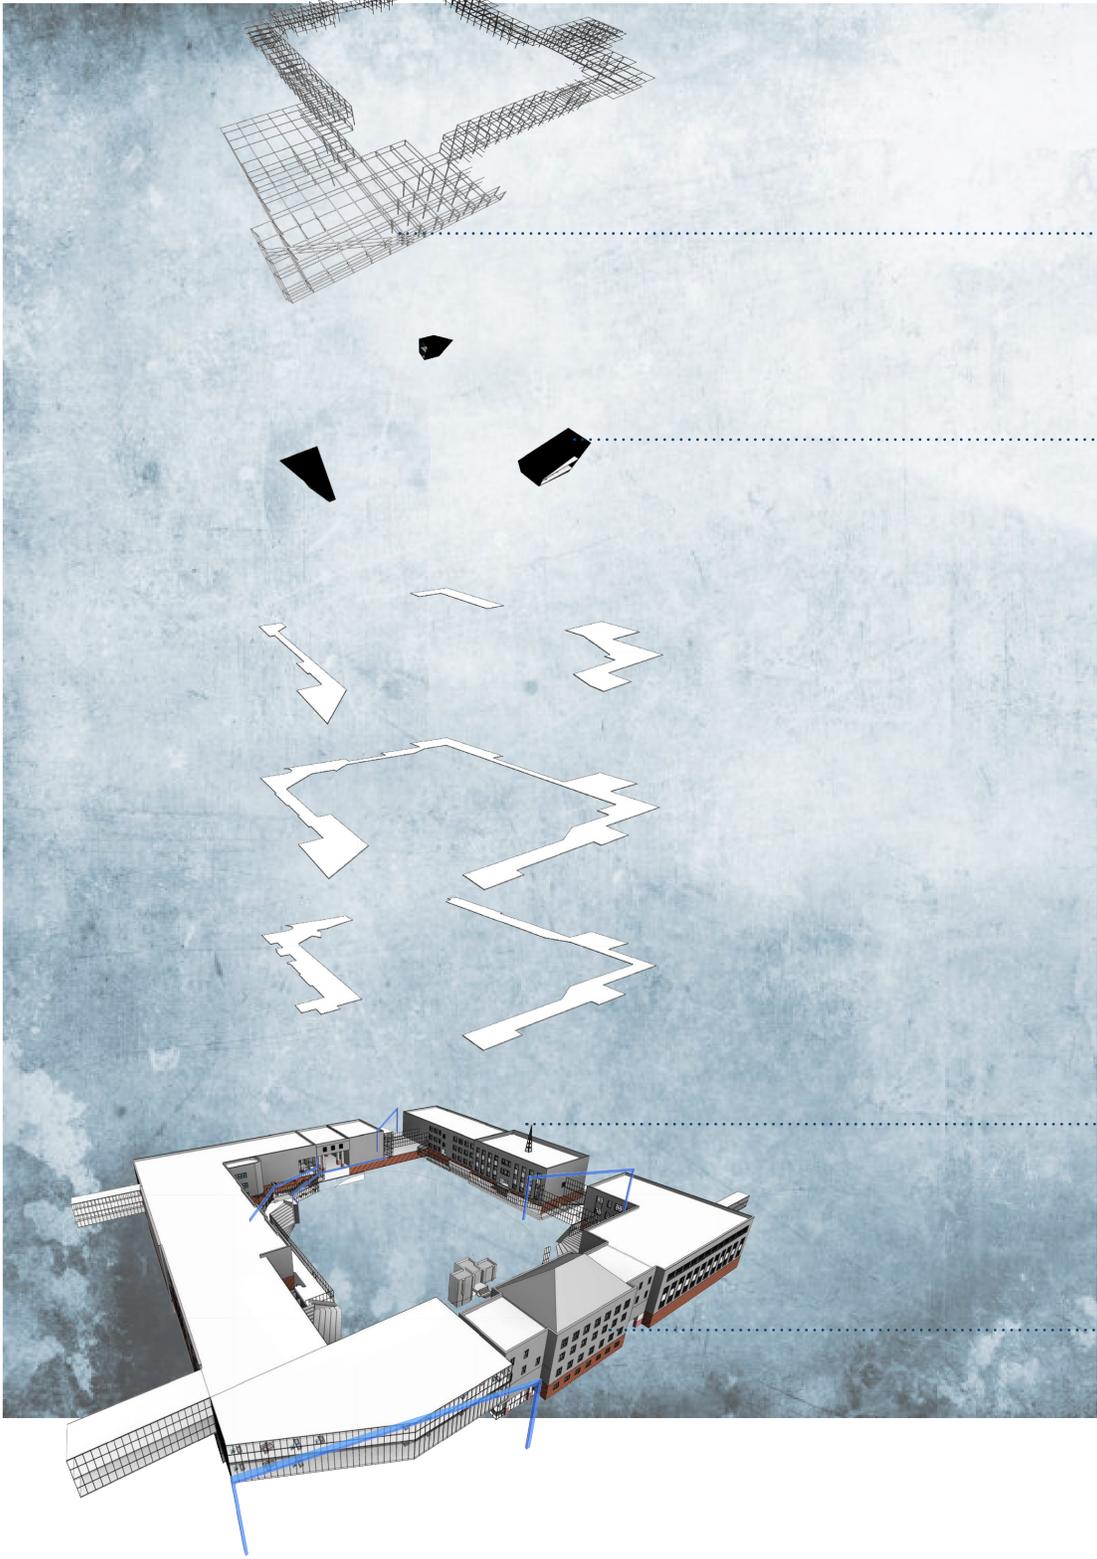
Exploded axonometric drawing showing location of proposed materials
